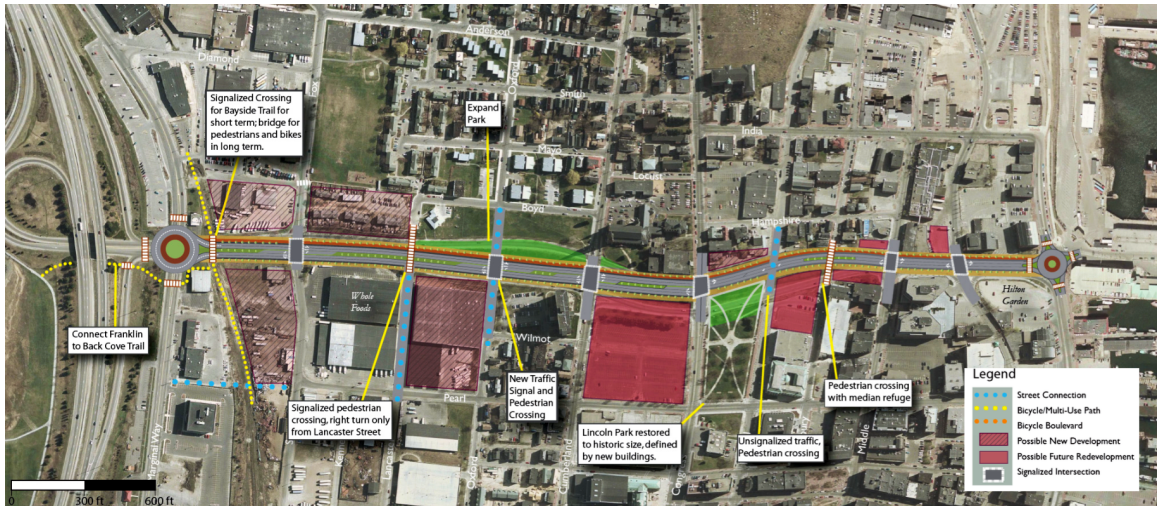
Urban Parkway Design (Franklin Street Arterial Study Committee, 2009)
